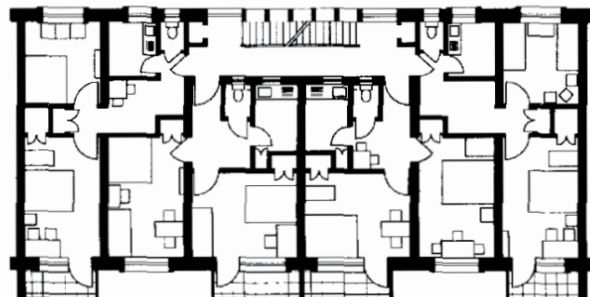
Plan of the No. 8014 apartment building (from Lu Junhun 2001, 155)
